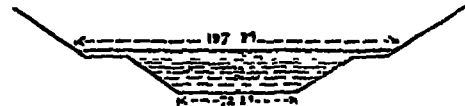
Cross-section of Suez Canal at El Guisr.
